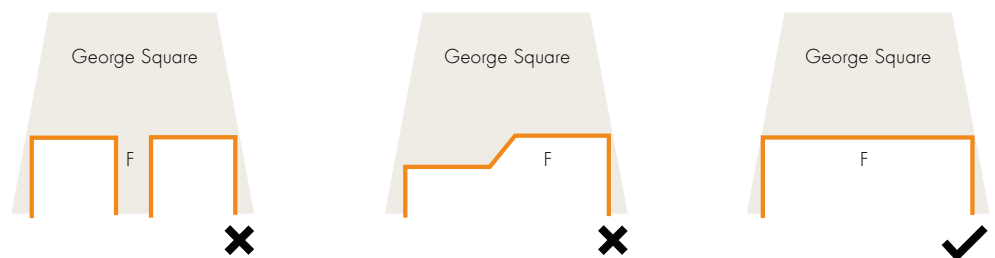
Diagrams showing acceptable and unacceptable George Square building arrangements in plan
